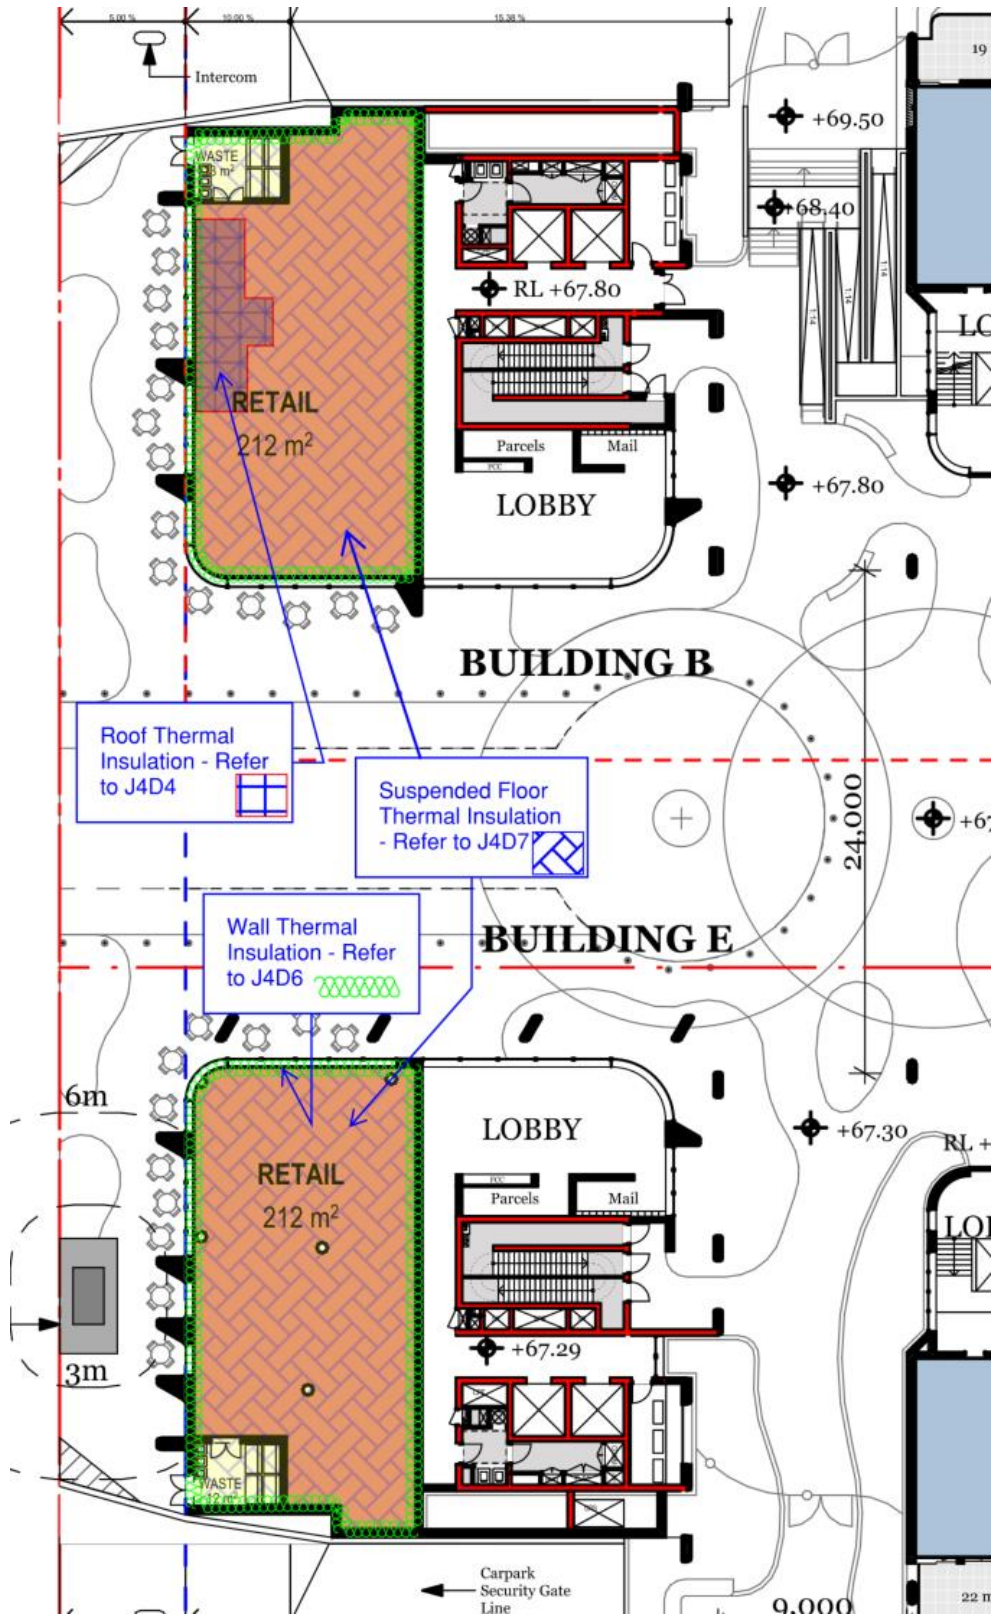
Ground level Conditioned Envelope (Thermal Insulation to Unconditioned spaces)
